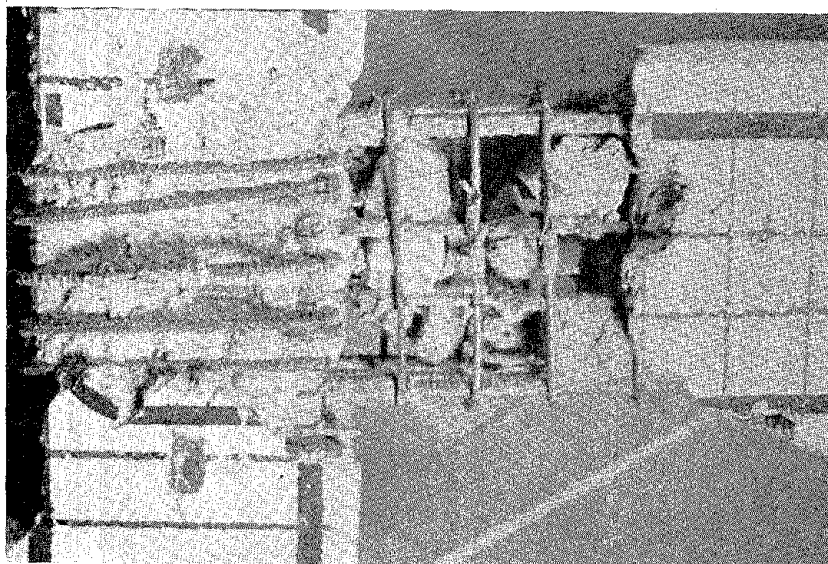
Hinging Region and Beam-Column Joint of Specimen 8 after Removal of Loose Concrete.
